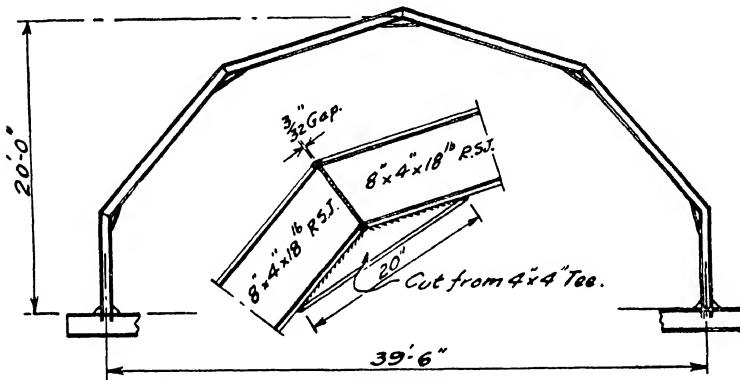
ROOF FRAME WITH RIGID JOINTS
